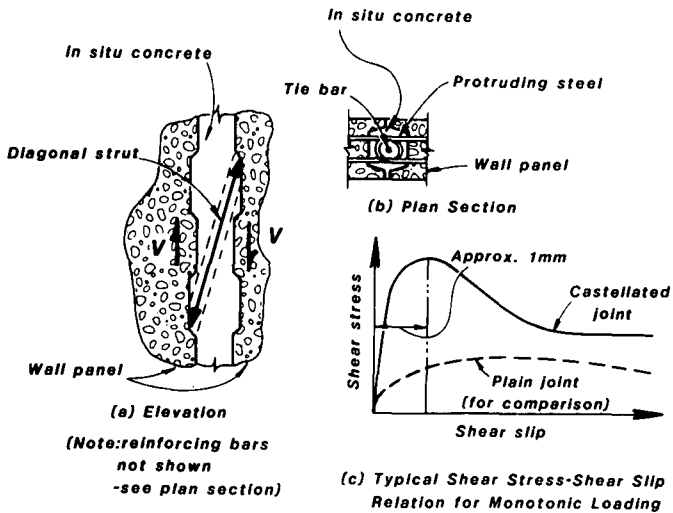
Typical Castellated Joint Between Prefabricated Large Panels.
